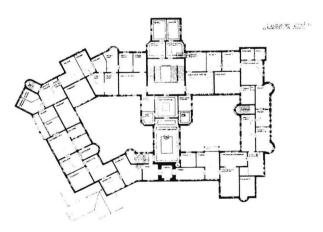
The museum competition entry. Plan of the first floor. (Original and photo as in Fig. 63).
